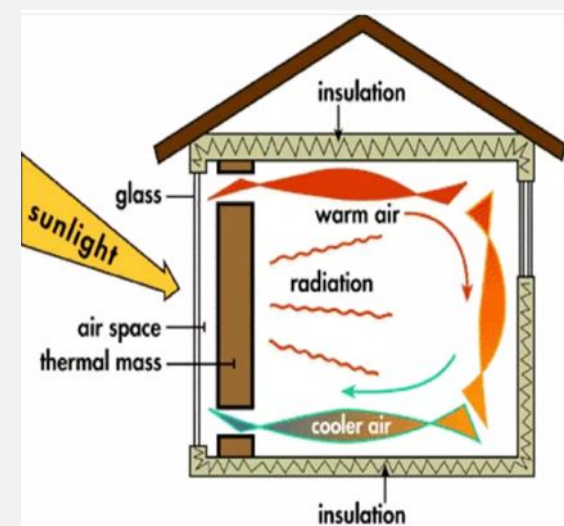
Thermal Insulation of the building (Source: Sheen, 2016)
